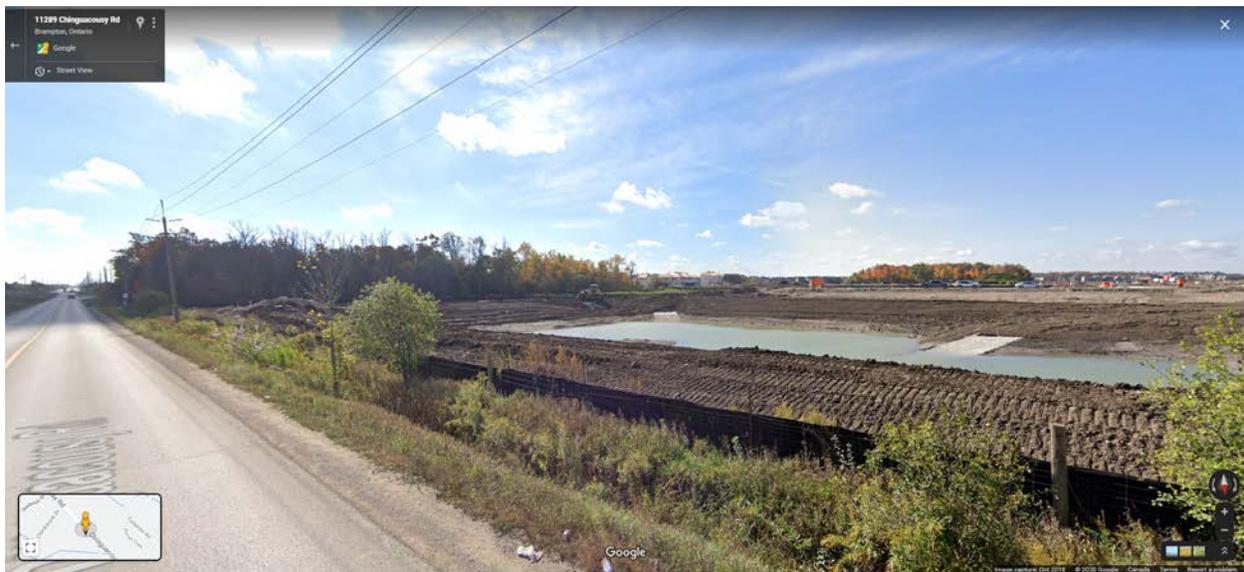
Looking west (across the street) from the subject property onto adjacent flood plain area and beyond
